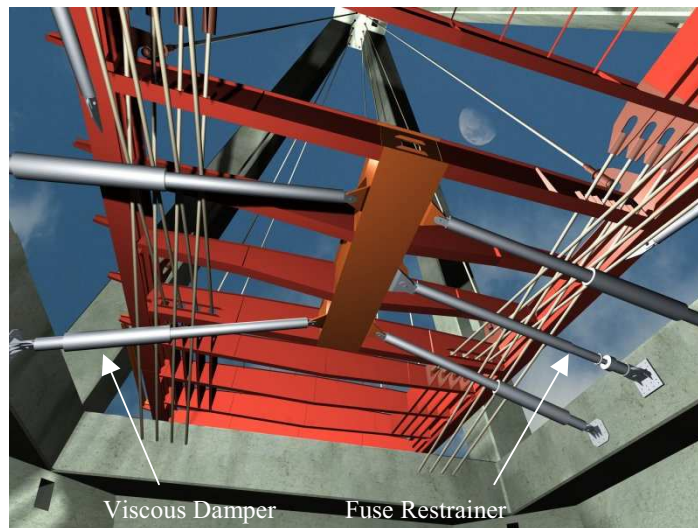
Rion Antirion Main Bridge: arrangement of viscous dampers on the main piers
